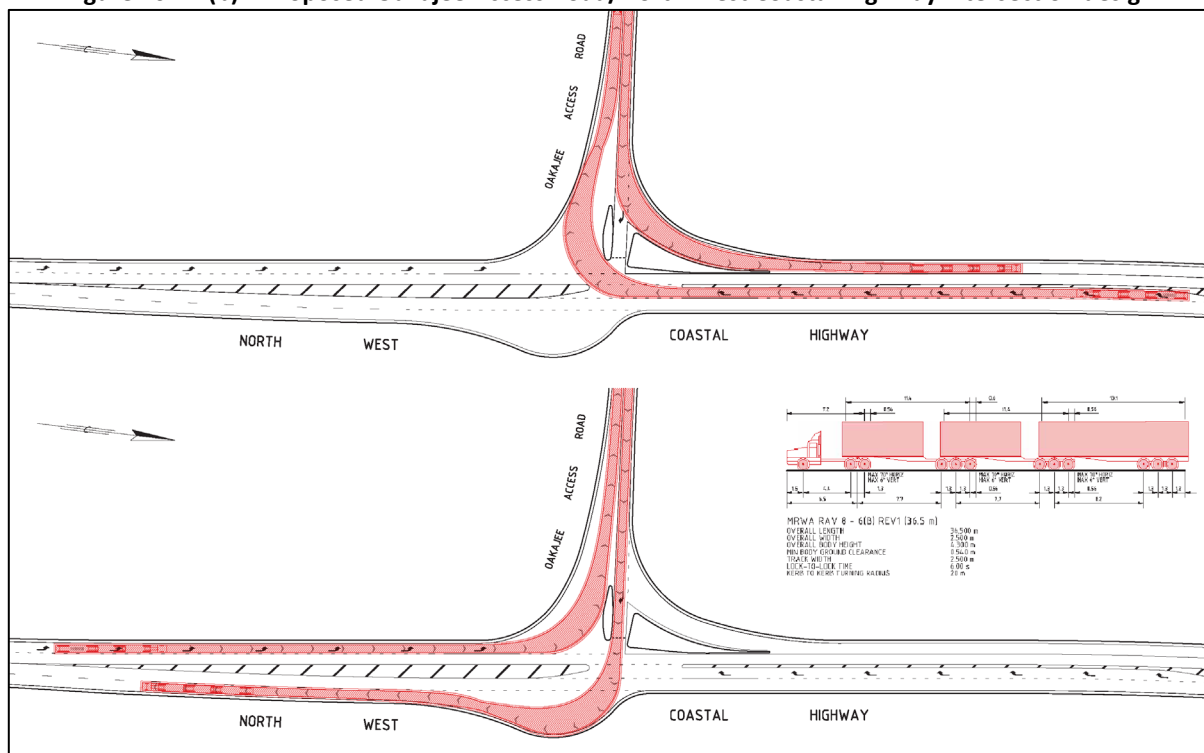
(b) – Proposed Oakajee Access Road/North West Coastal Highway intersection design
